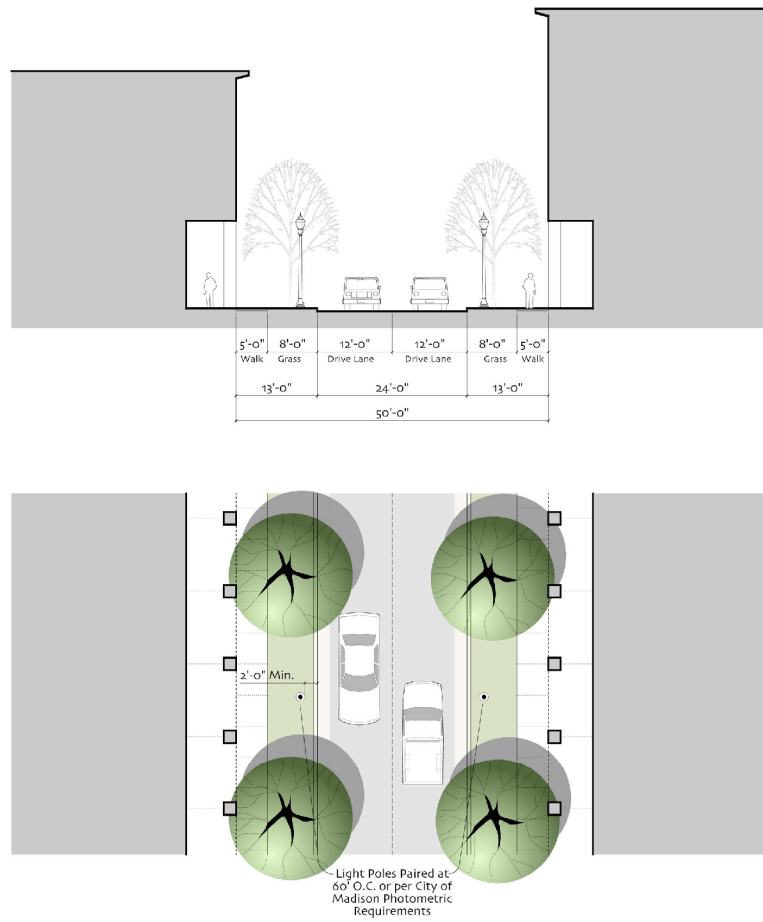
Street Type C: Entry to internal street from Hughes Place, section and plan.
